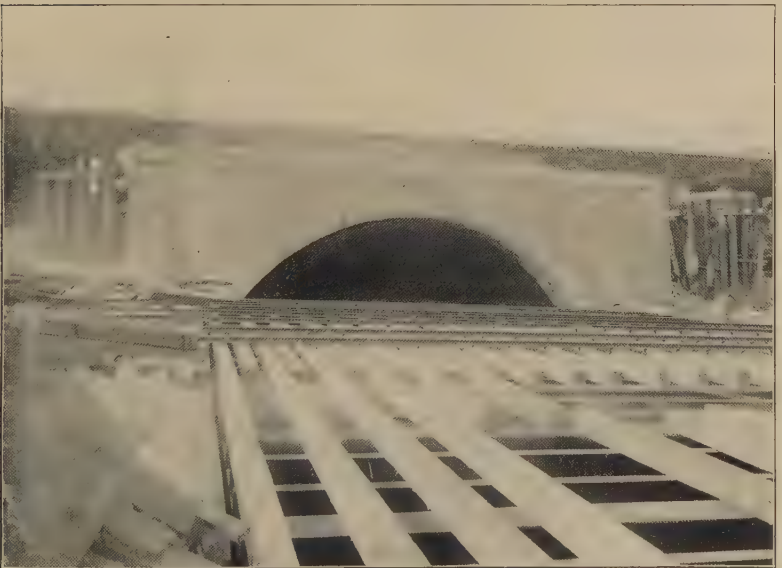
WALWORTH OUTLET. VIEW OF TERMINAL ARCH, SPAN 50 FT. ALSO SHOWING STEEL
